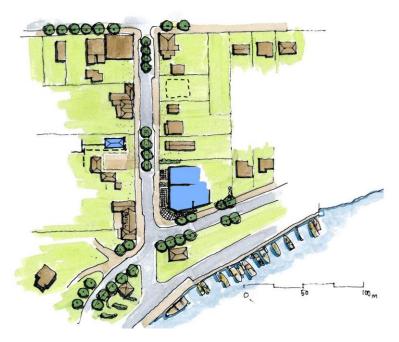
Triabunna Town Centre Concept Plan (NB: potential infill buildings are shaded blue)
